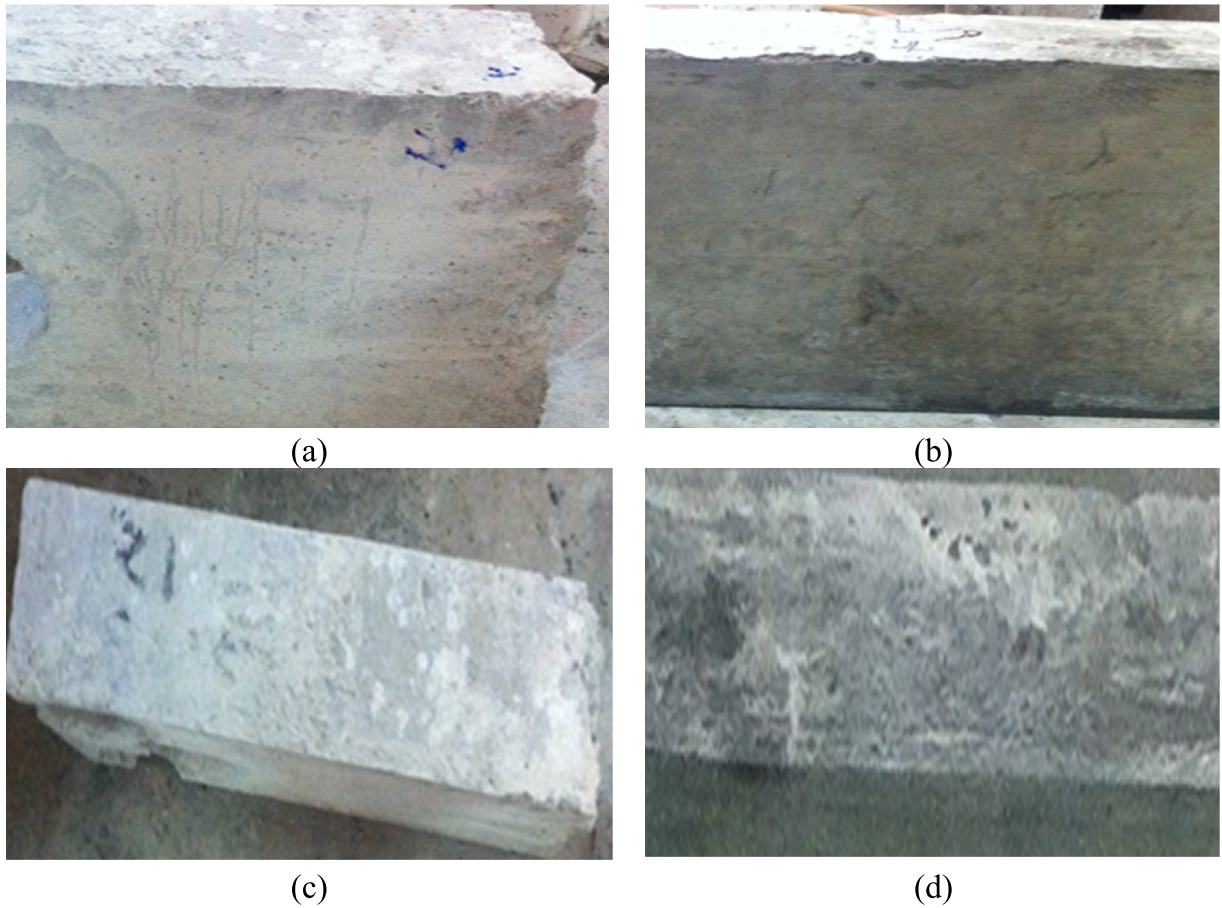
Examination of the appearance of the lateral surface of the beams made with (a) stable concrete and (b) unstable concrete. Examination of the appearance of the upper surface of the beams made with (c) stable concrete and (d) unstable concrete.
